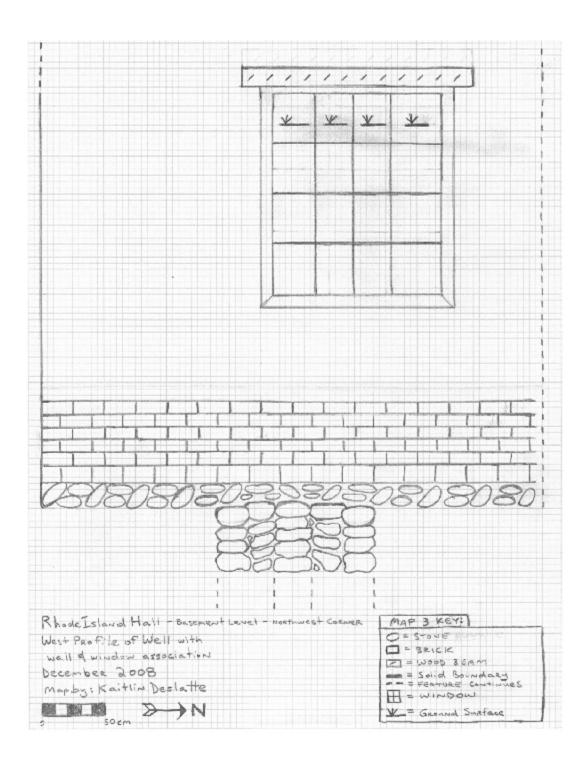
Survey Map 3 illustrates the west profile view of the well, foundation wall, and window. The three materials for the foundation wall are visible.
